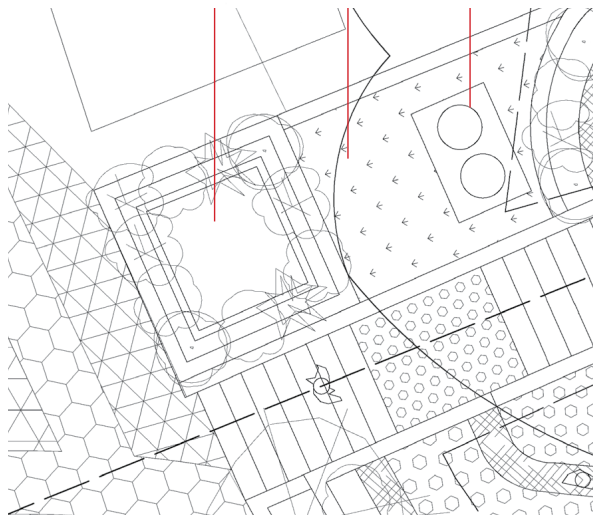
Rest-room on plan (not to scale) (Author 2015)
